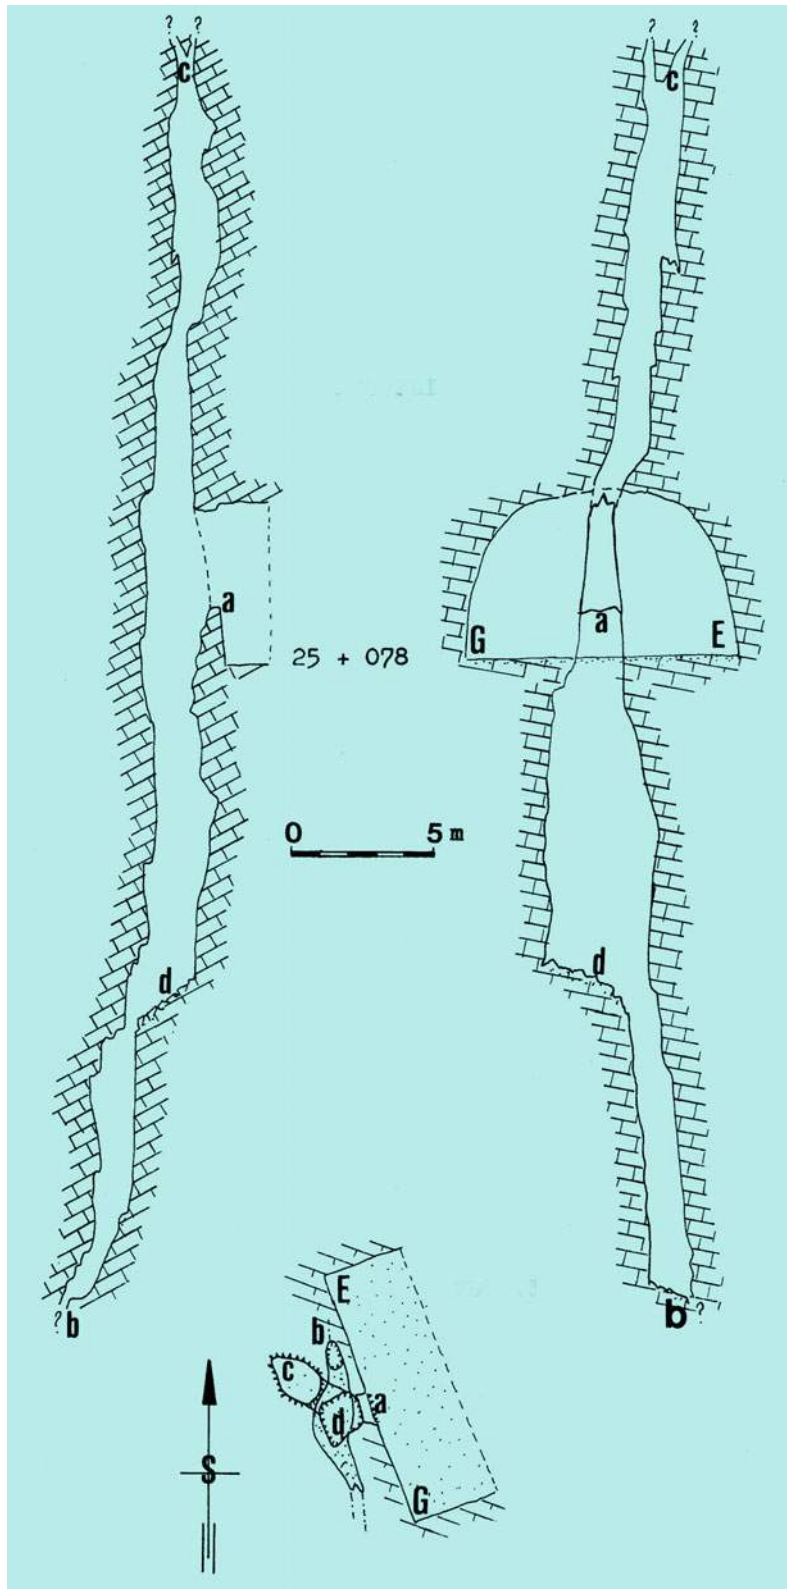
Plan and profile of cavern at km 25 + 078 in Tuhobić Tunnel
